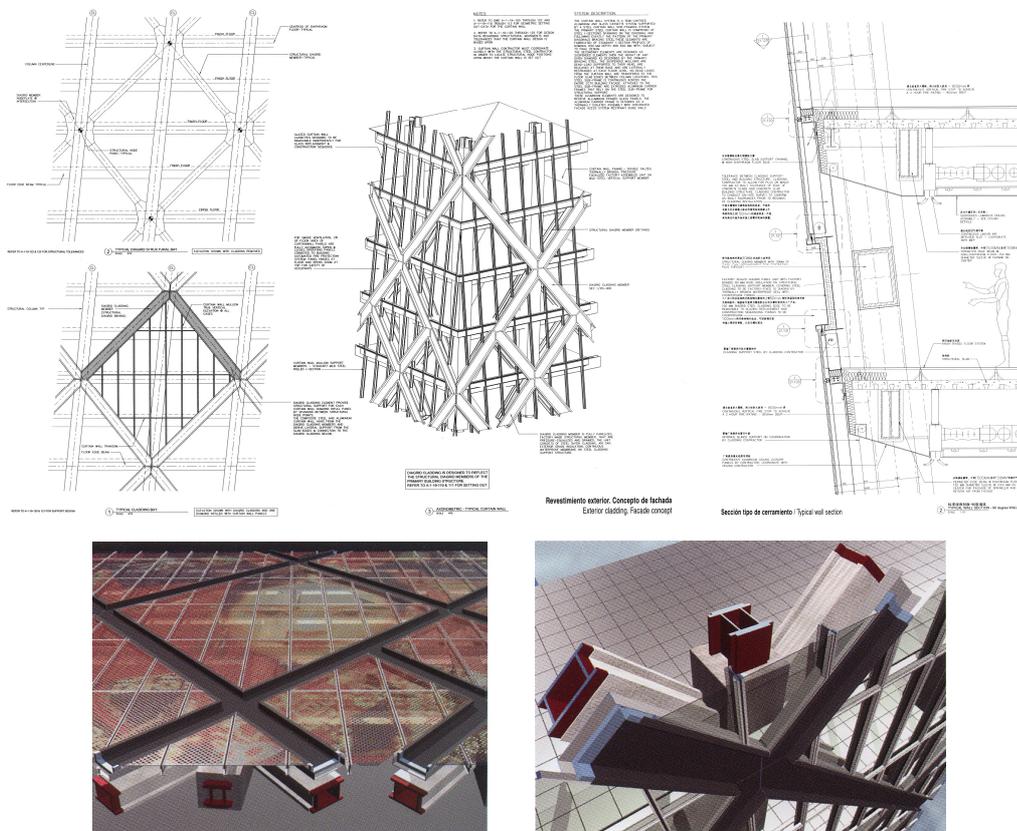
CCTV Tower by Rem Koolhaas. Façade details.
